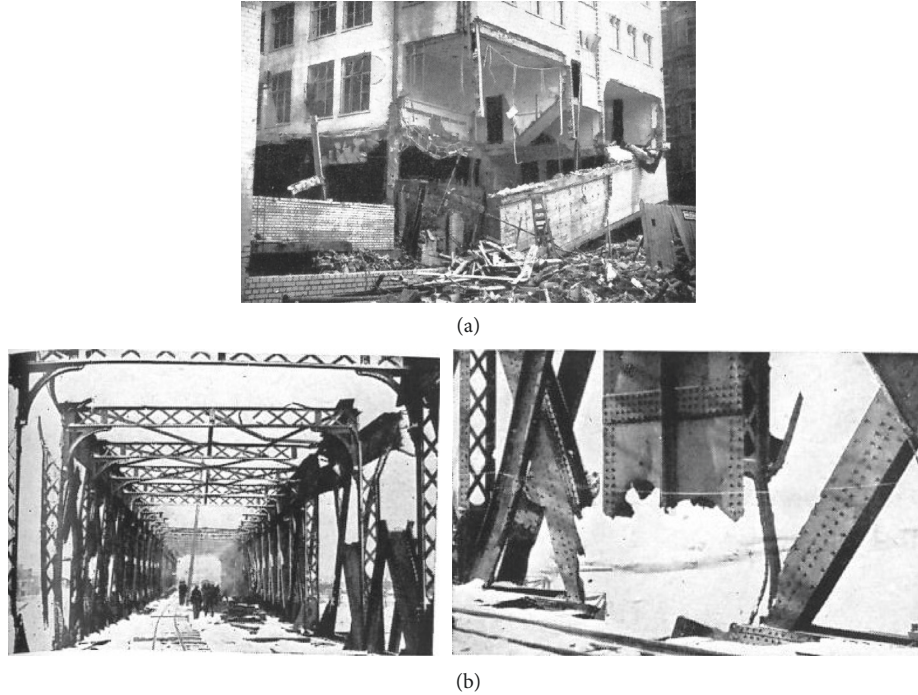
Examples of changes in structural system after local damage during extreme event (bombings during WWII): (a) seven-storey steel-framed office building reported by [37] after the main plate girder was blown down by a direct hit; (b) damage over the Oissel Bridge over the Seine reported in [38] (photographs used with the permission of the Institution of Civil Engineers, ICE).
